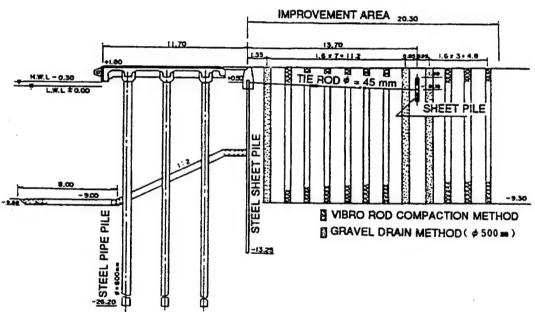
Examples of Soil Improvement for Waterfront Retaining Structures (PHRI, 1997)
